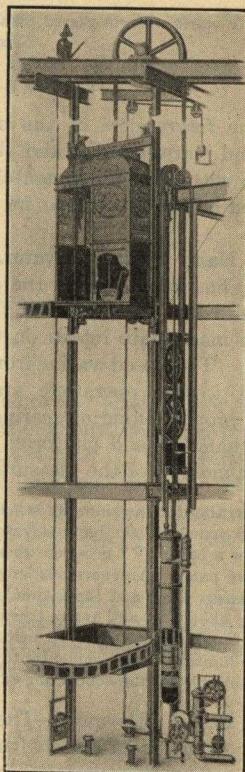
Rope geared hydraulic elevator—vertical type.
